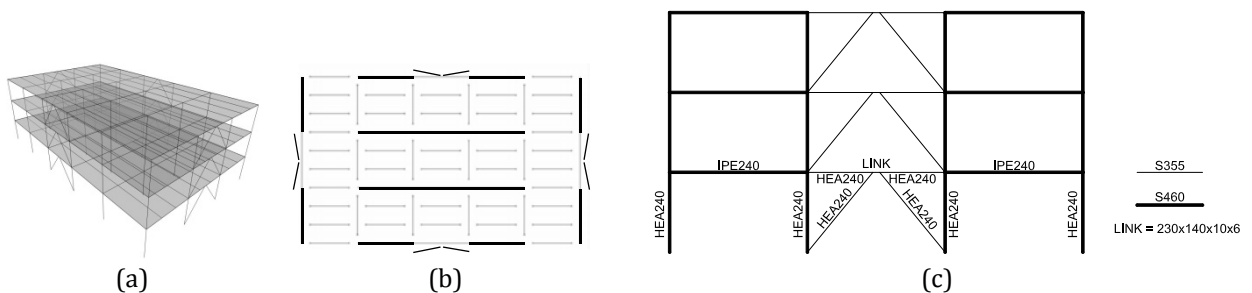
Structural configuration: a) 3D view; b) plan view; c) transversal end wall frame
